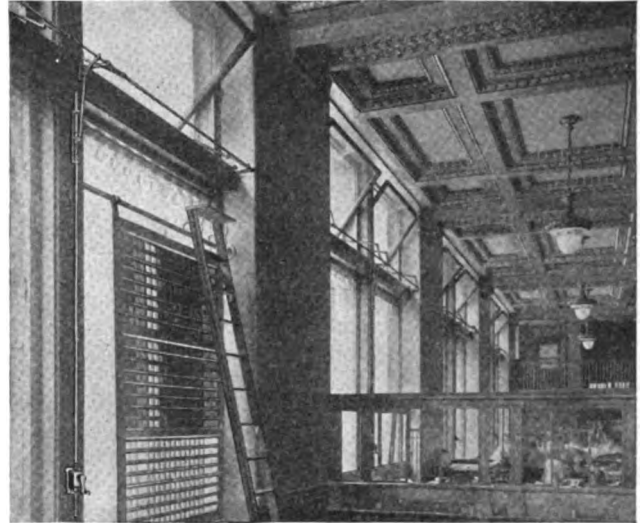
SCREW THREAD TRANSOM OPERATORS
